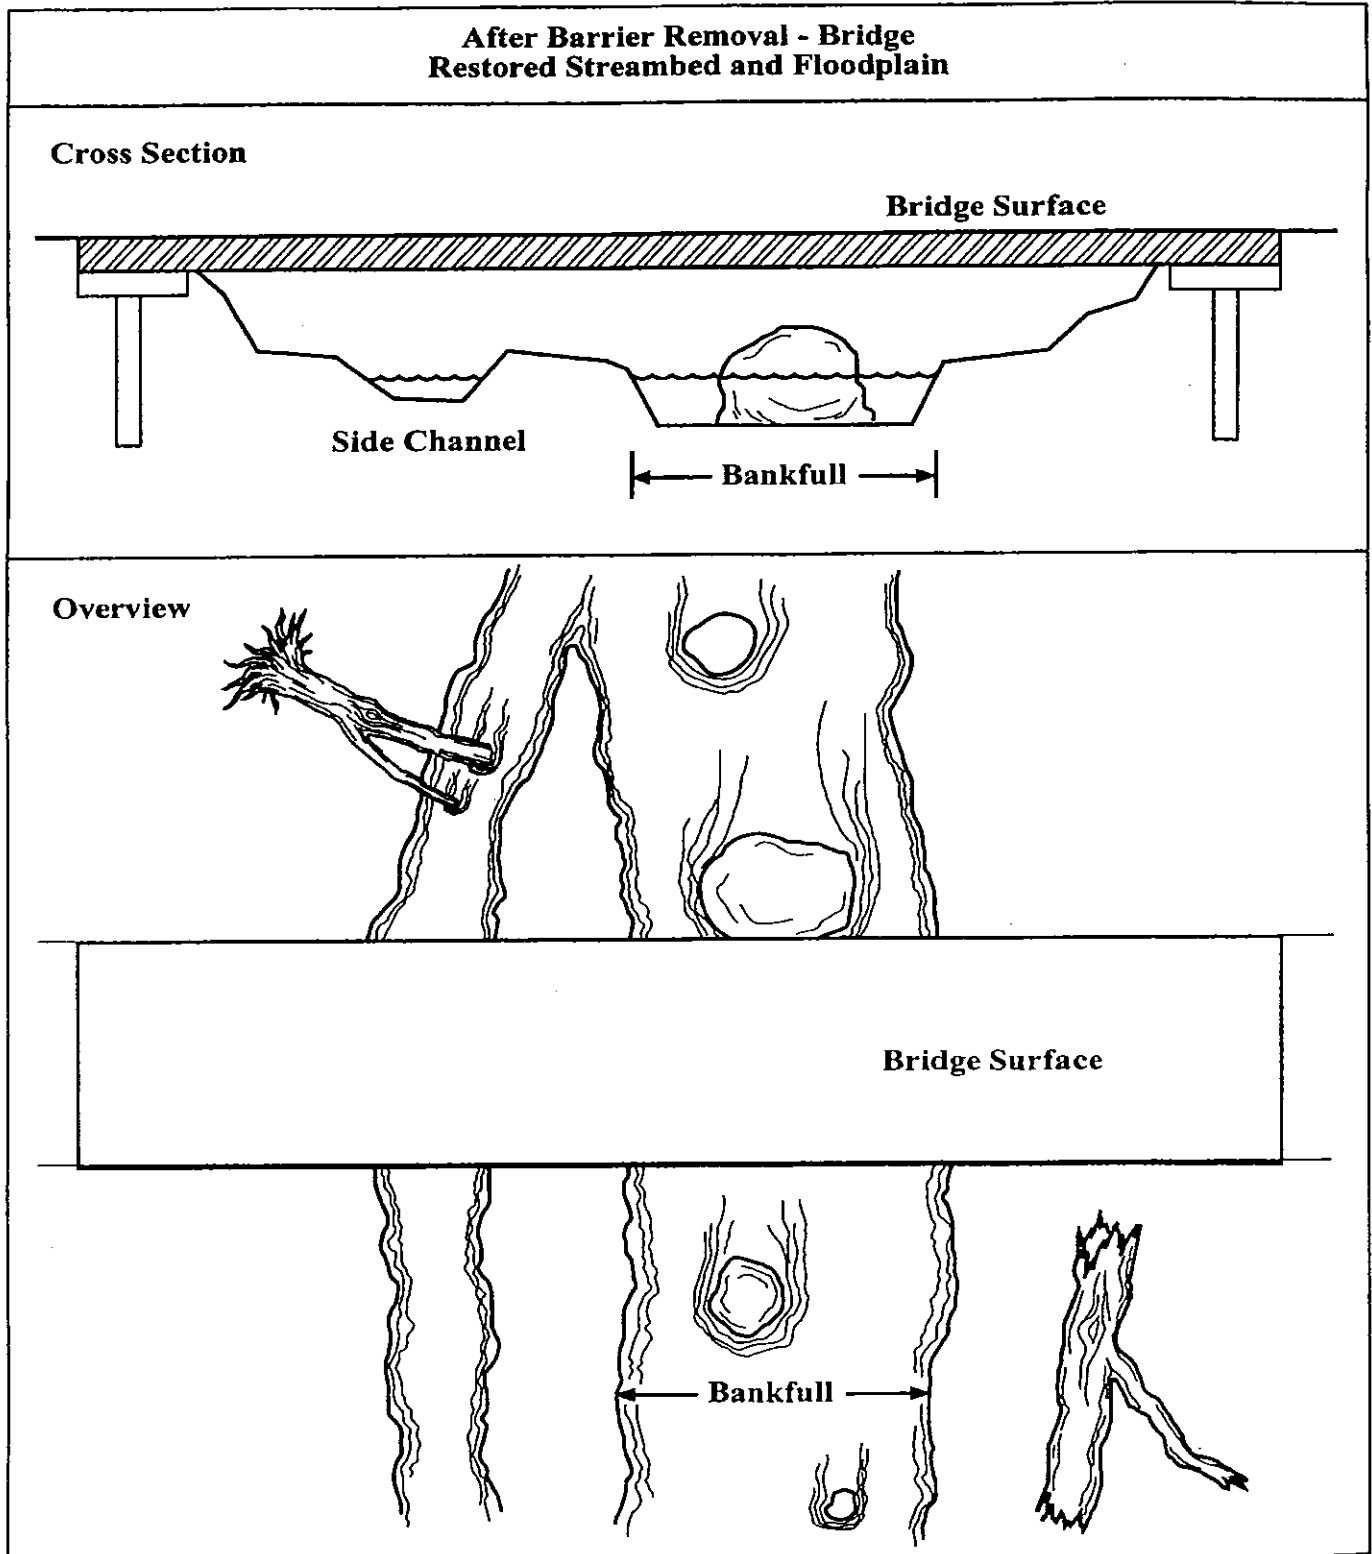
Typical Cross Section and Overview of Culvert Replacement with a Bridge
